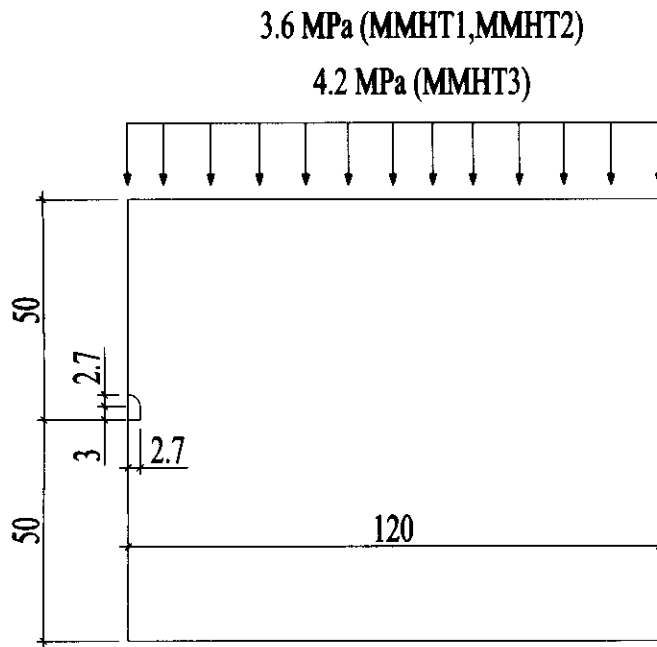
Numerical cross section of MMH tunnel model (unit: m).
